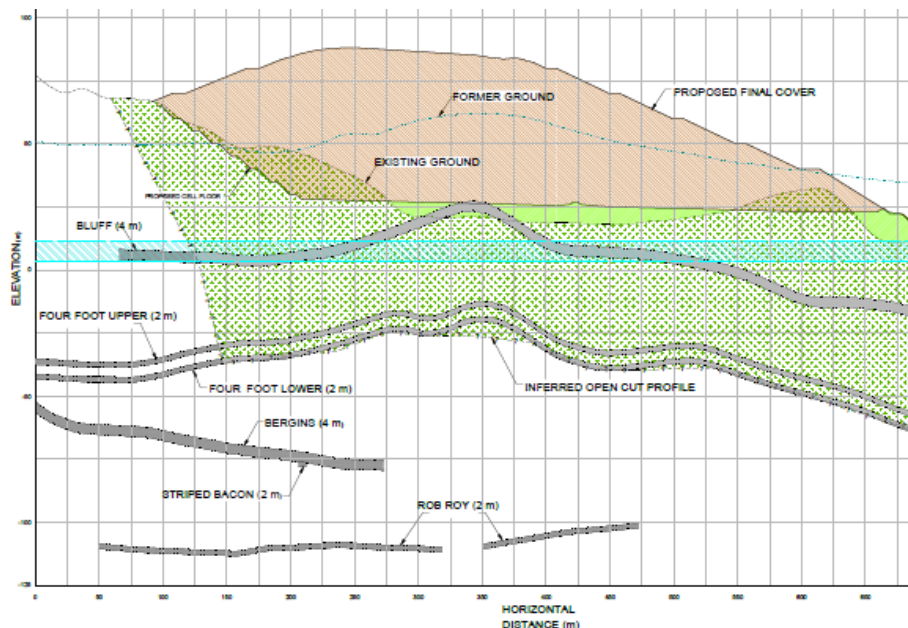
Cross section (looking north) of concept landfill design and underground workings
